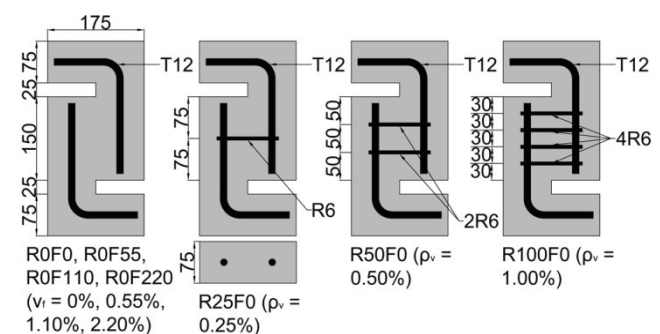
Specimen geometry and reinforcement layout (dimensions in mm)
